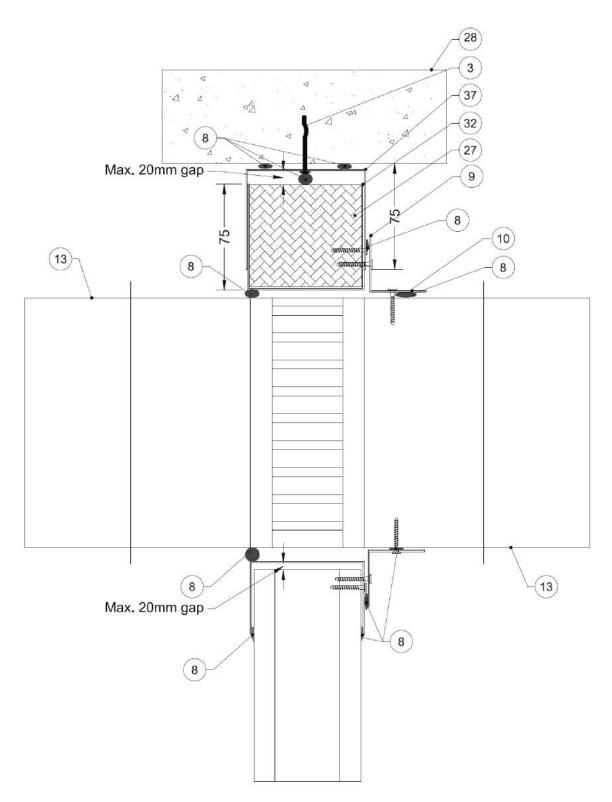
Kilargo Damper installation 55mm-75mm from top or side
